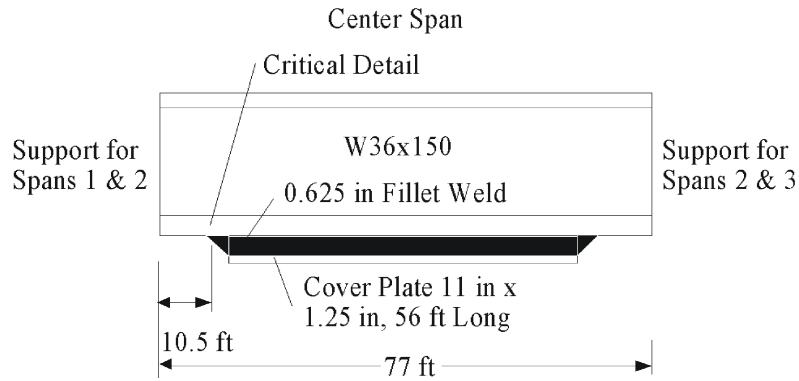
Welded Cover Plate Girder, Detail No. 4
